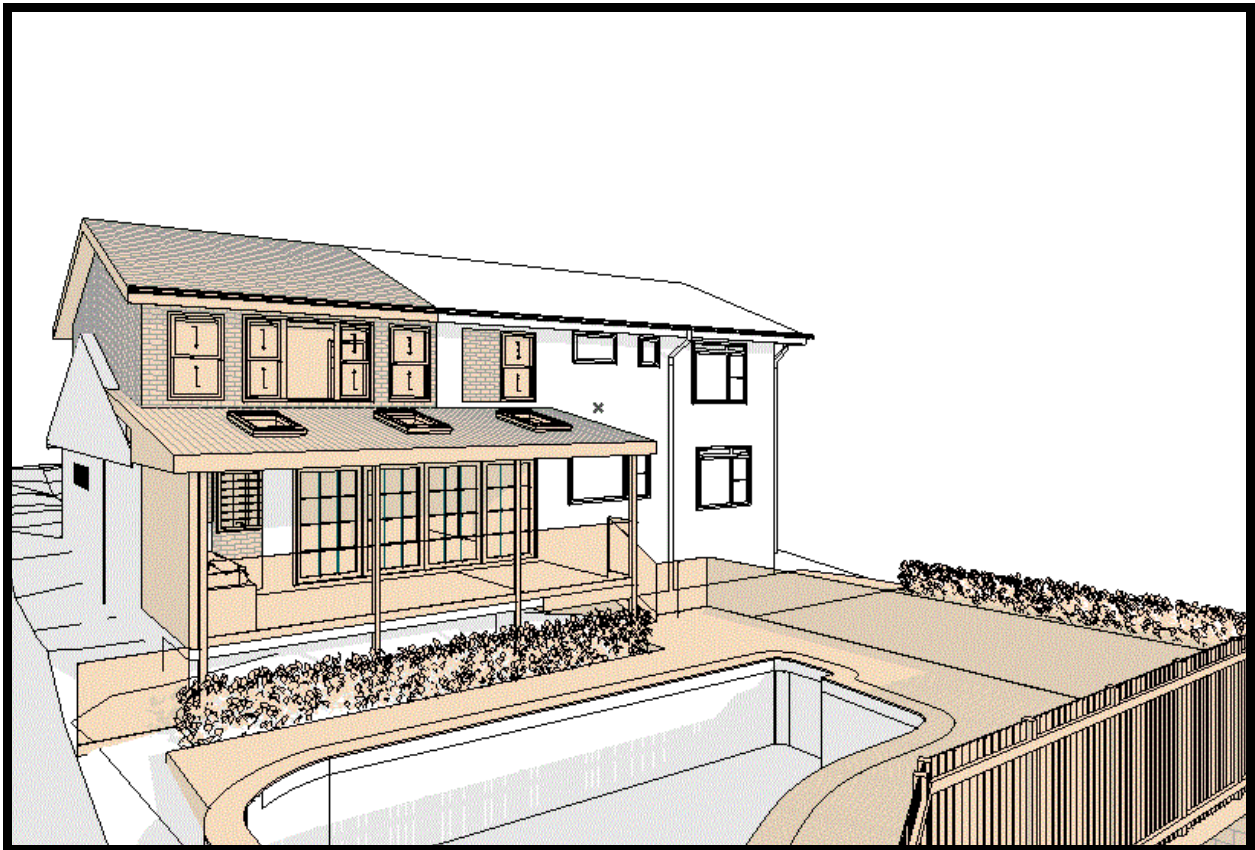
Proposed works at No. 36 Karina Crescent. (*Action Plans 2019*).
